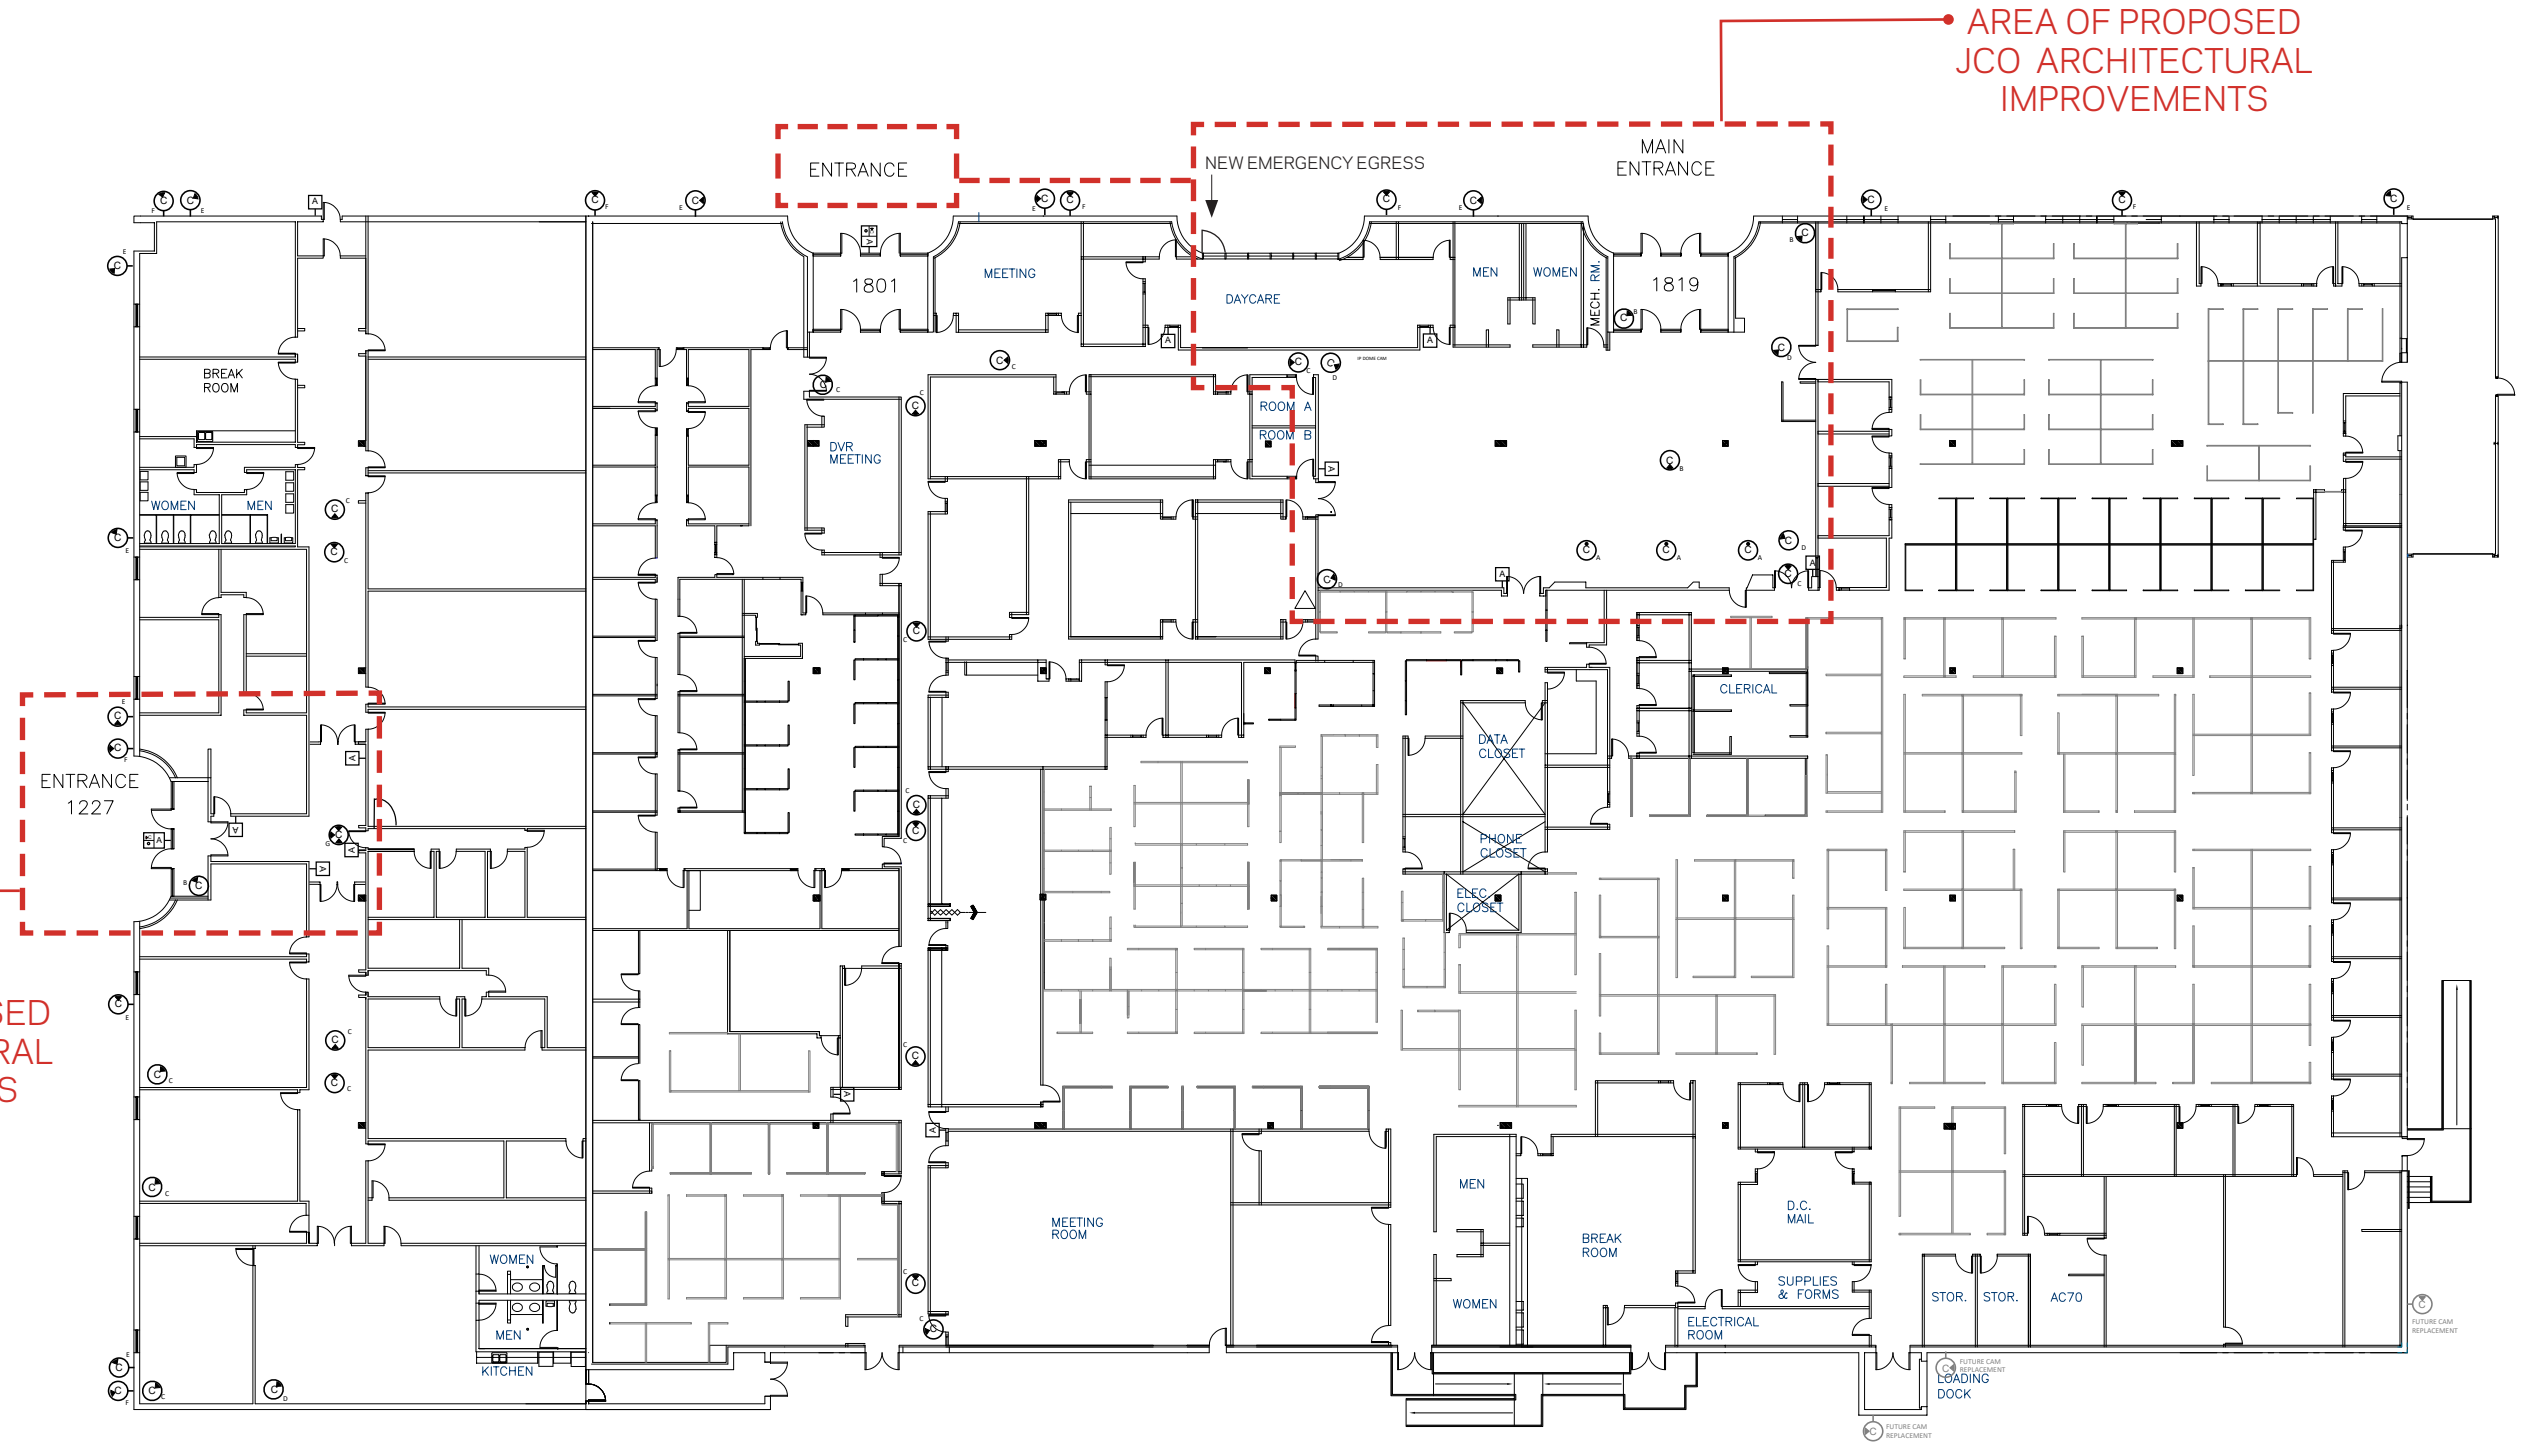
Floor Plan Indicating Camera and Card Reader Access Locations.
